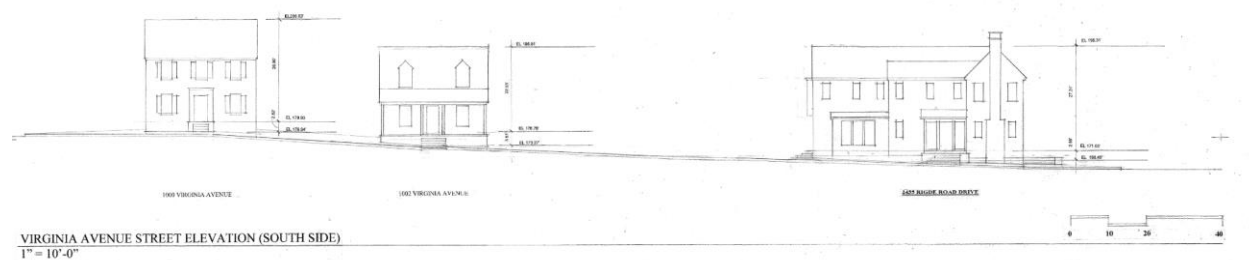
Virginia Avenue Streetscape (Proposed Dwelling on Right)
